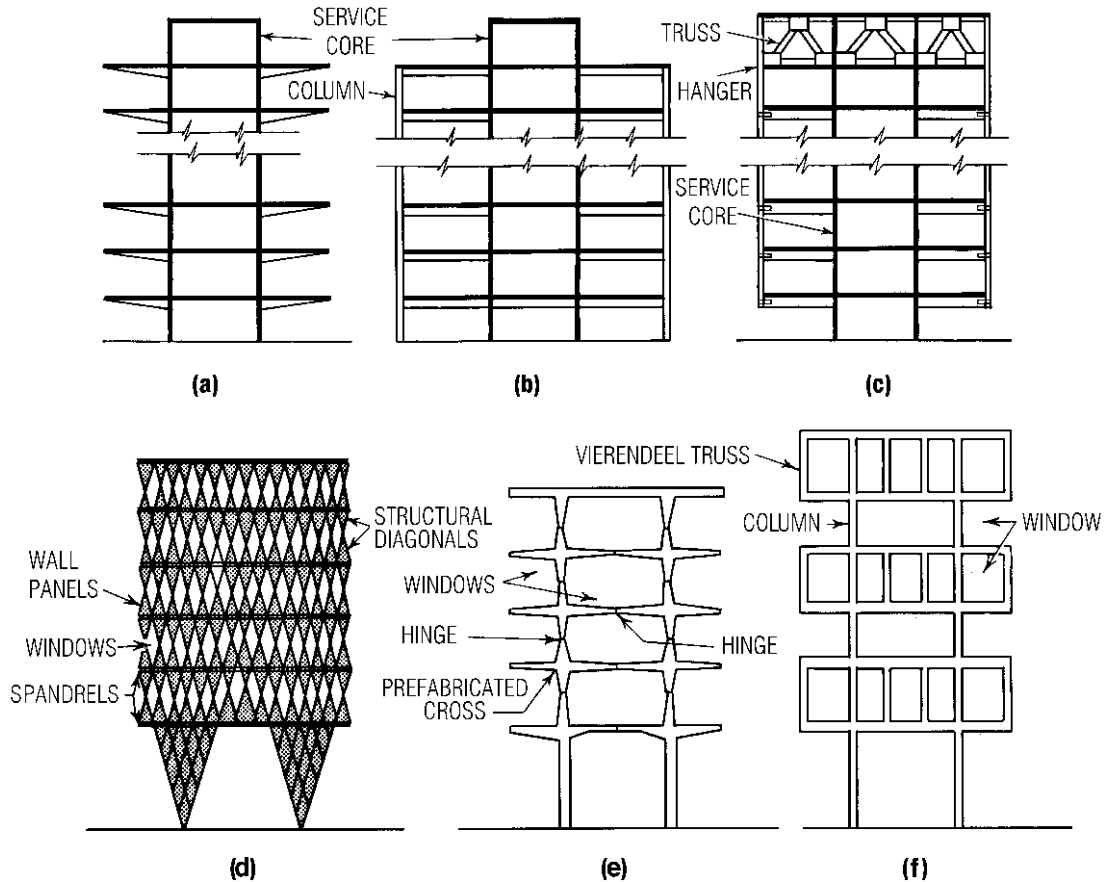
(a), (b), (c)—Framing arranged to place all, or nearly all, loads on service-core walls; (d), (e), (f)—Examples of architectural-structural walls.
